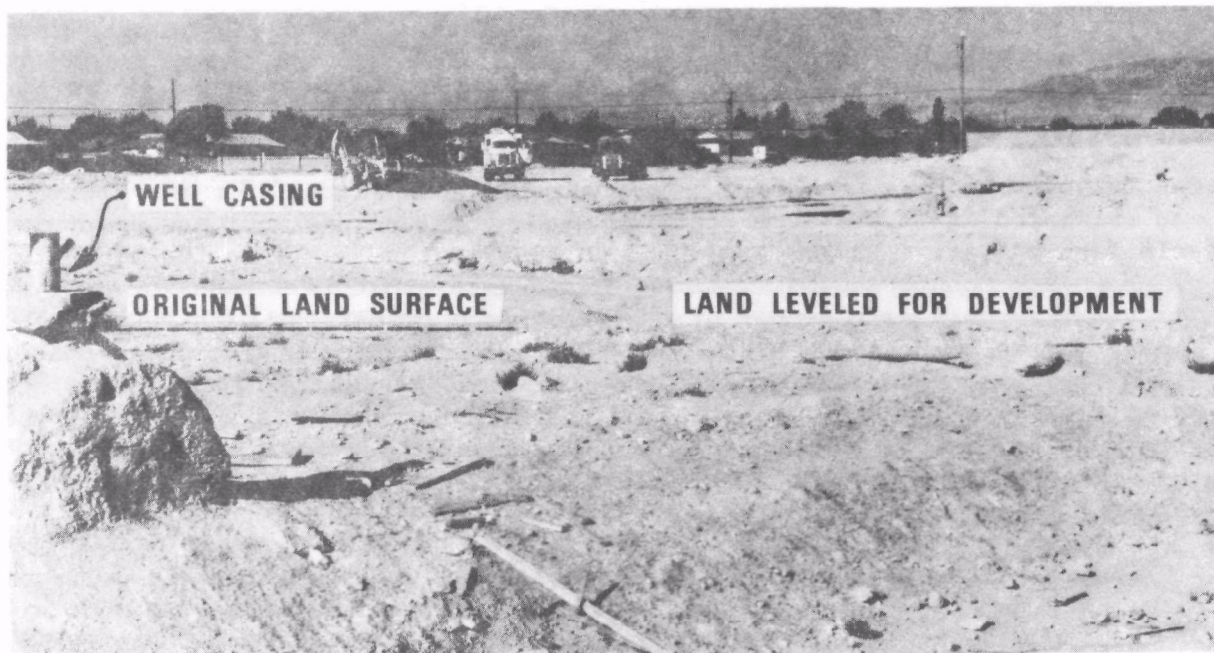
Photograph showing typical soil excavation and land leveling in preparation for construction of a subdivision.
